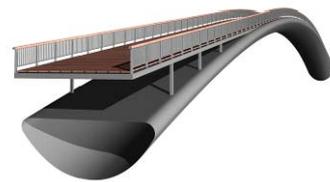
and 54 – Stainless steel arch footbridge (photomontage) and perspective of model
